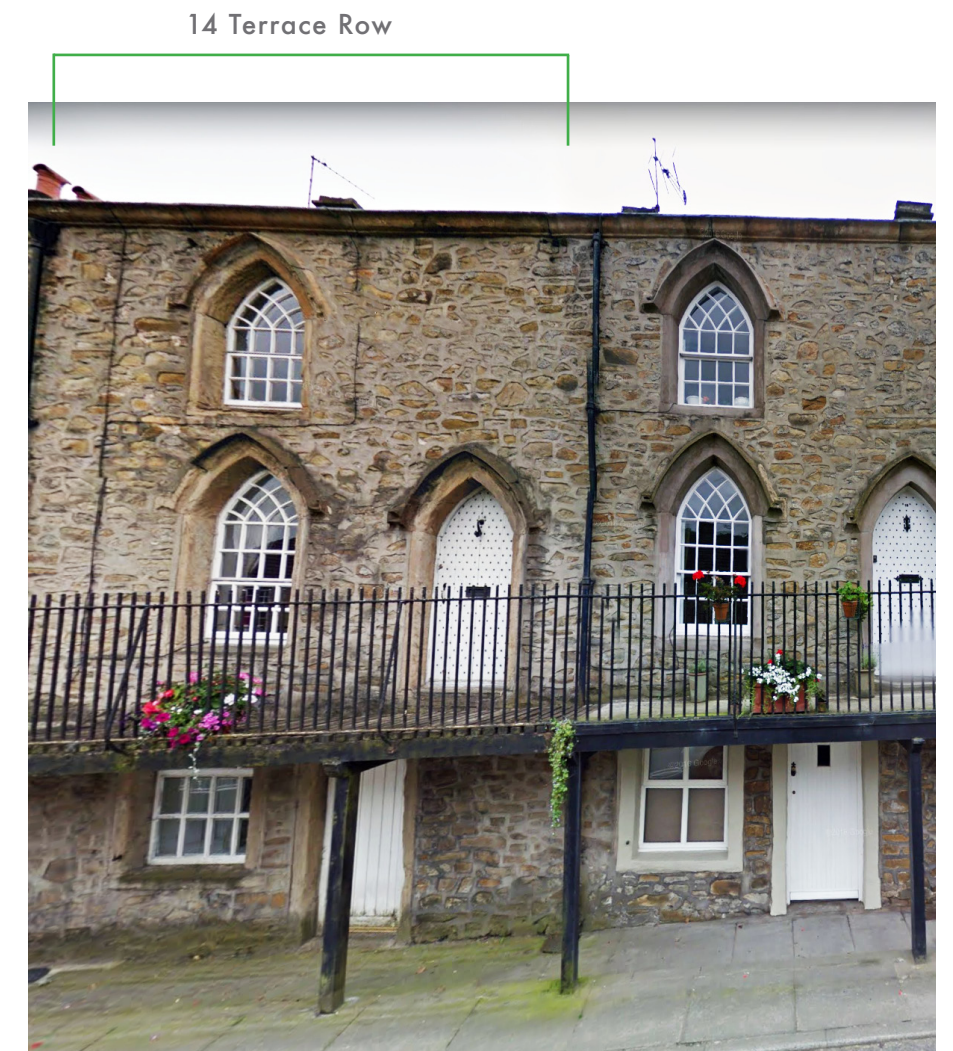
North (Principal) Elevation Terrace Row showing ground floor single glazing window and door to bedroom.
